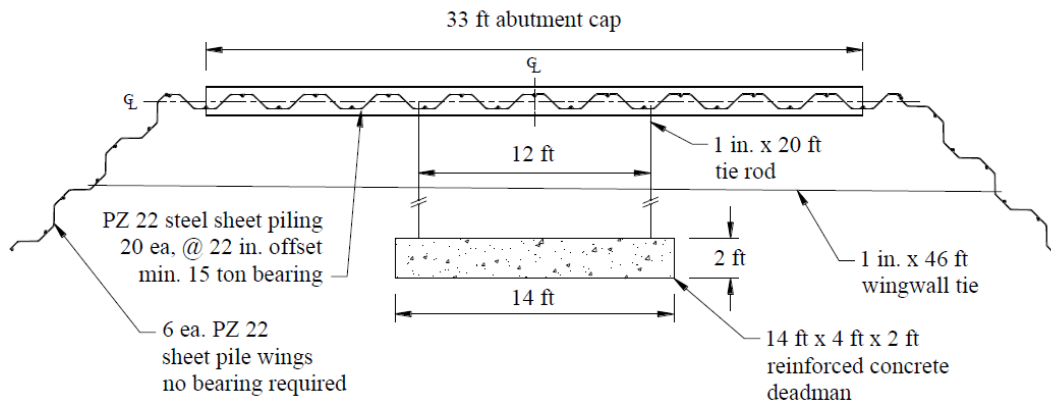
Plan view of the sheet pile abutment and backfill retaining system (Evans et al., 2012)
